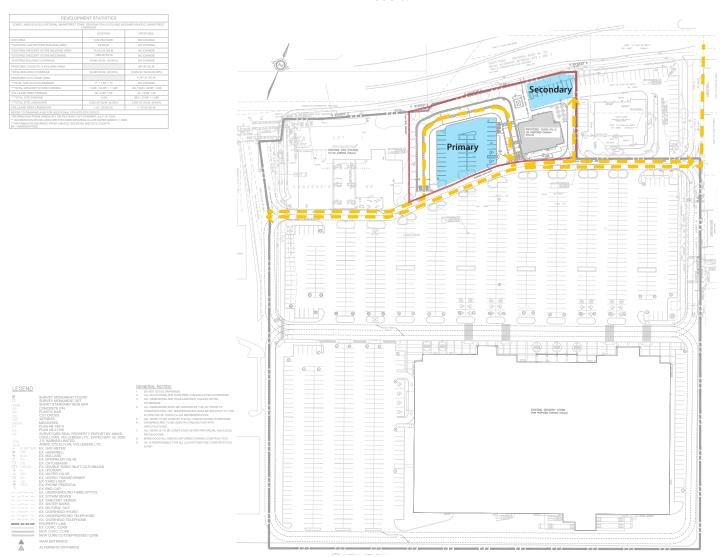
Proposed Overall Site Plan showing car circulation of site by EXP.
